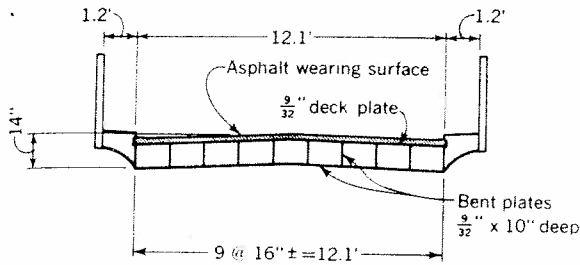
Autobahn overpass at Jungingen, Germany (1934)
